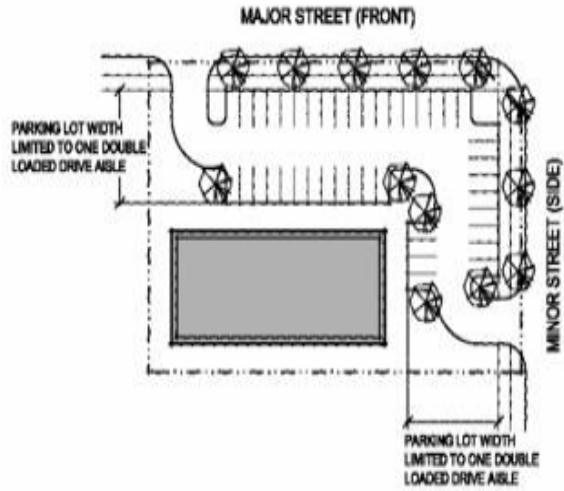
Example of two rows (one (1) bay) of parking permitted between a building and the right-of-way.
